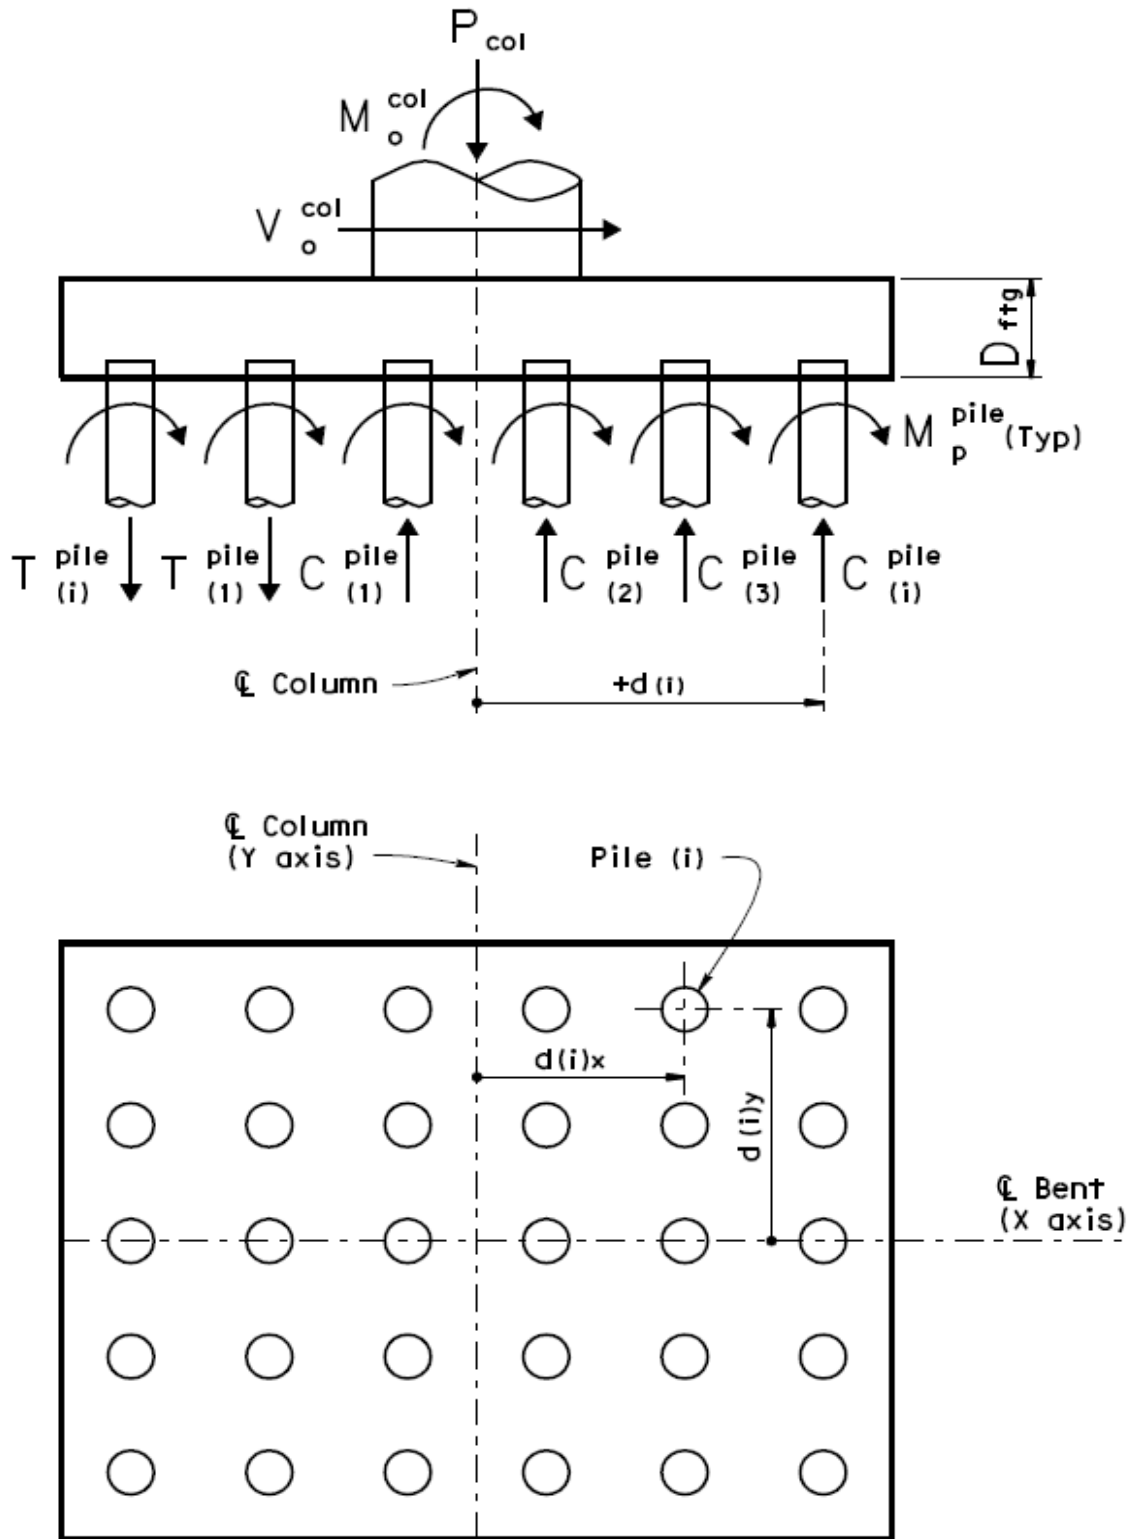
A-1 Simplified Pile Model for Foundations in Poor Soil and Soft/liquefiable Marginal Soil
